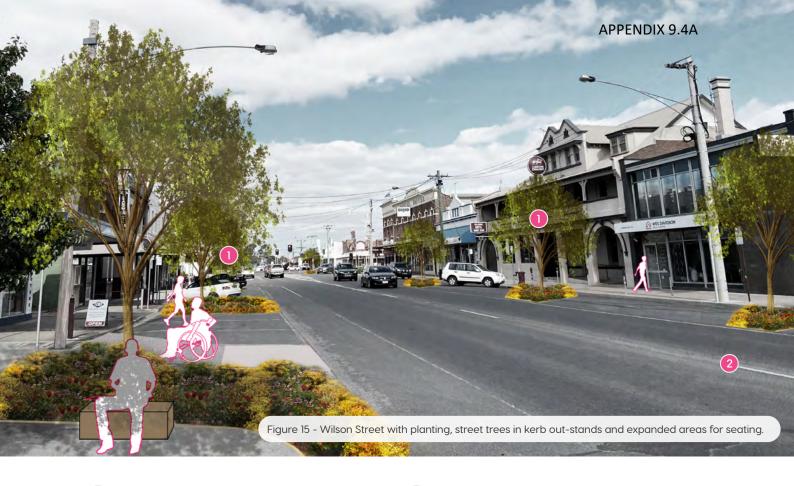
depicts improved streetscape amenity along Wilson Street while Figures 16 and 17 show a proposed plan and section respectively.
